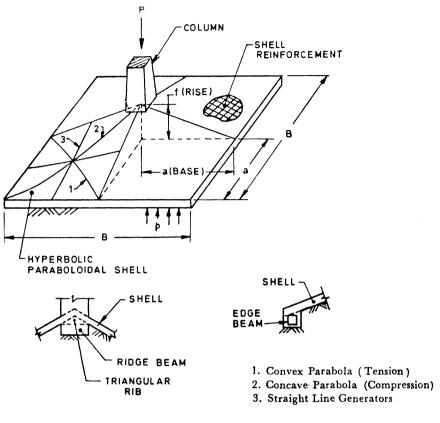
HYPERBOLIC PARABOLOIDAL SHELL FOOTING
